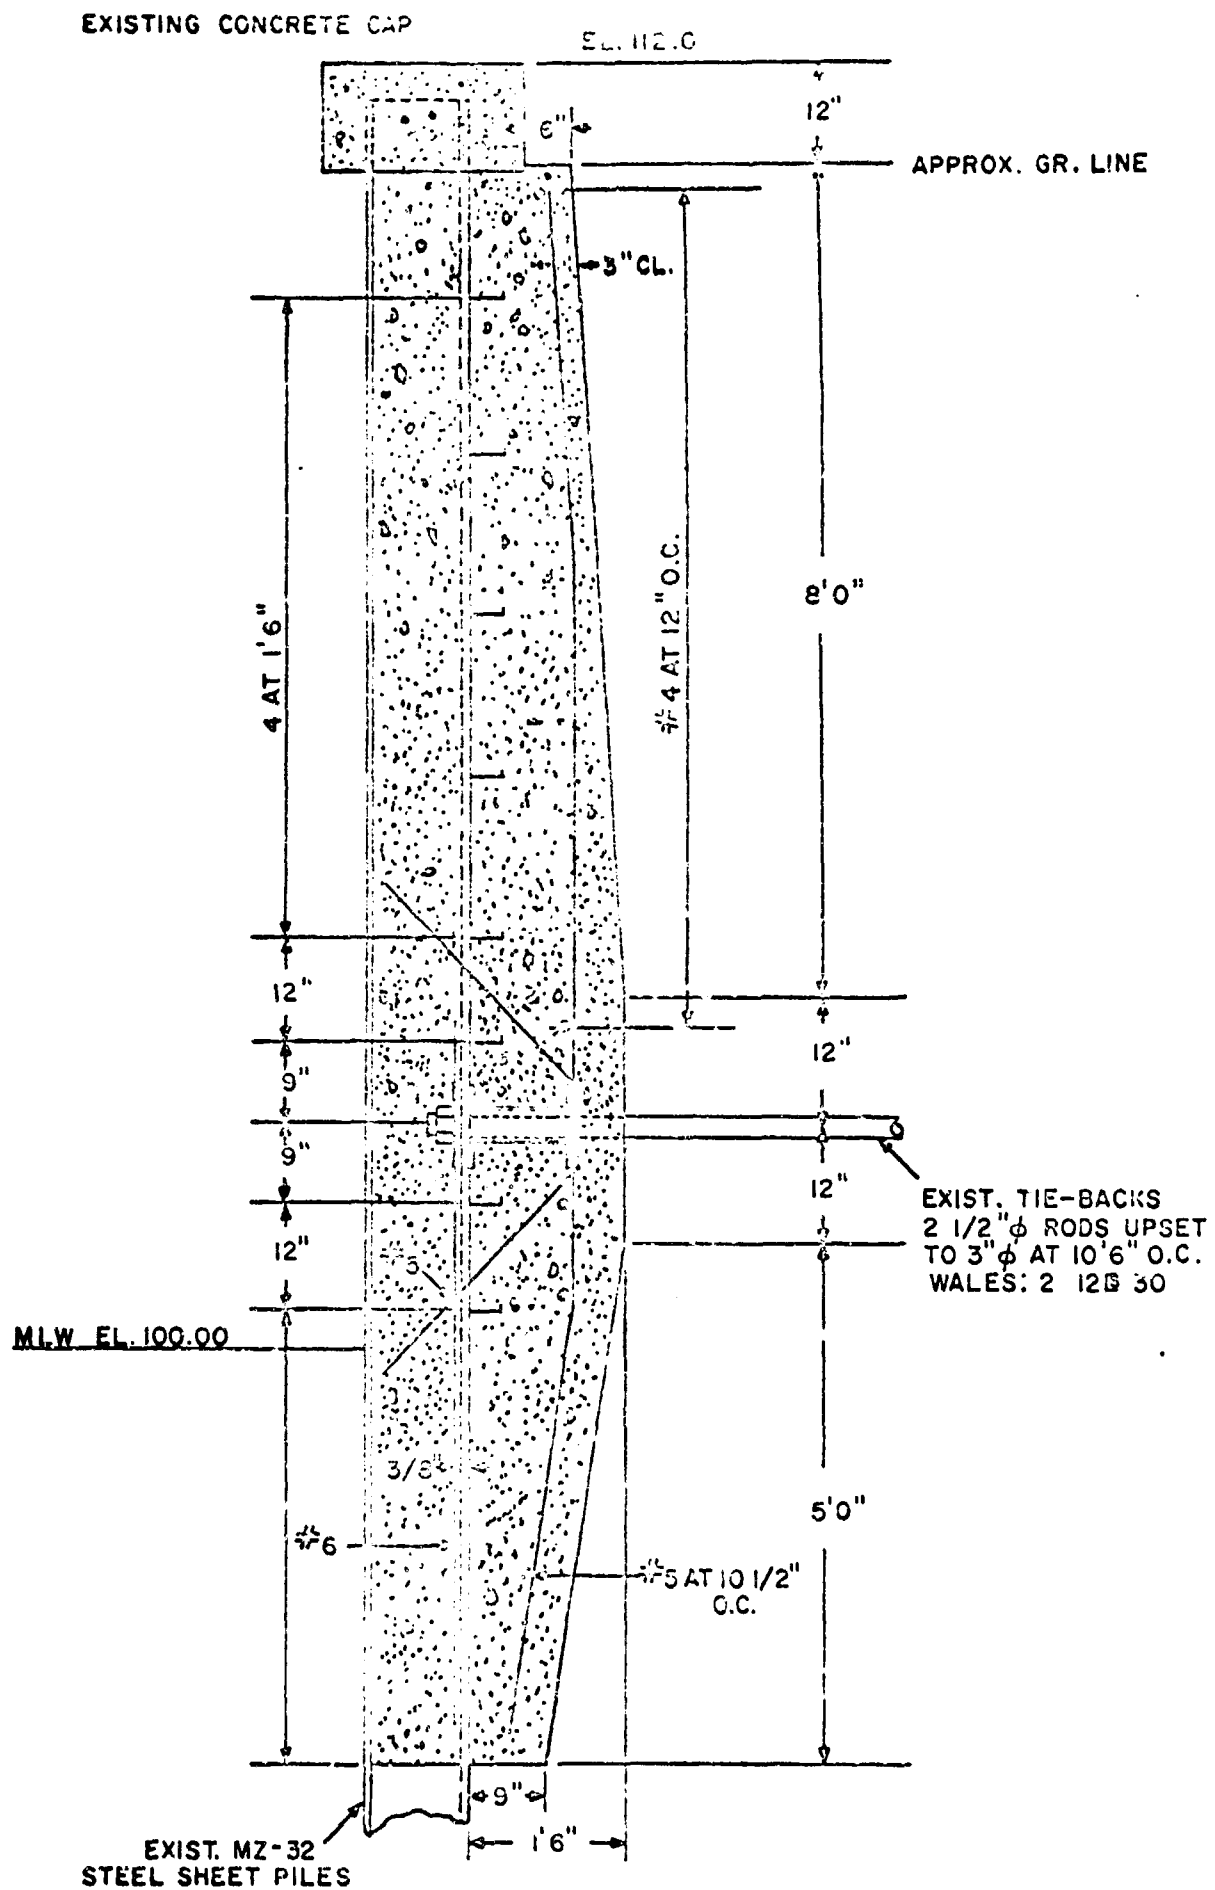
ELEVATION SHOWING TYPE A REPAIRS
